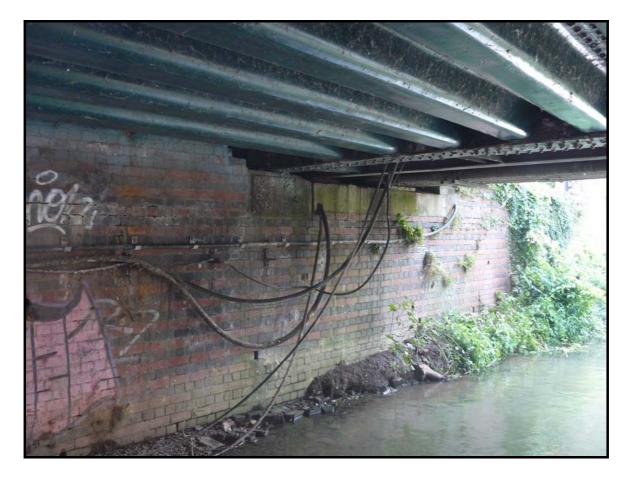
Sheepwash Bridge, cables suspended across the width of the south abutment.
